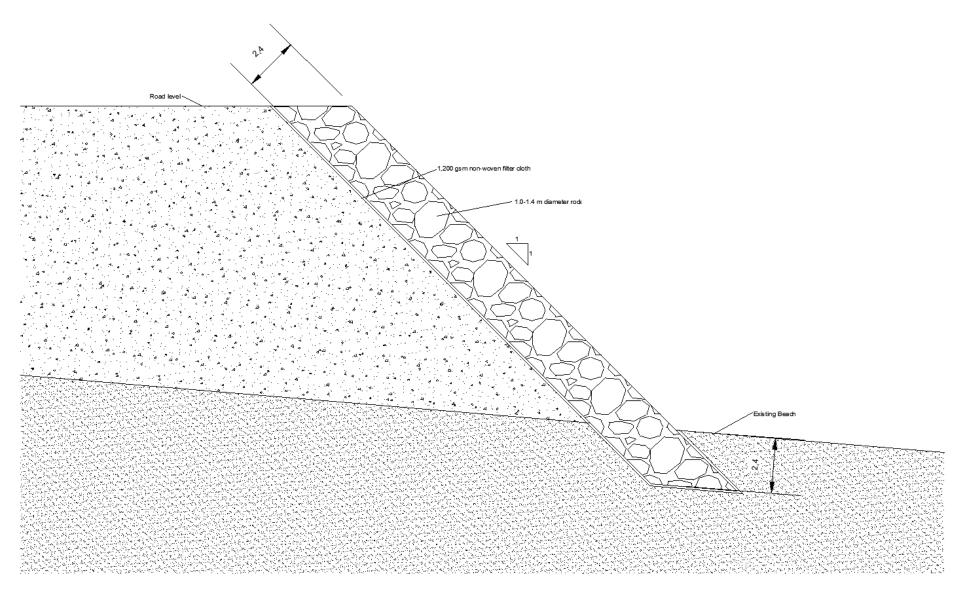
Generic cross-section for the revetment at Purangi Road.
